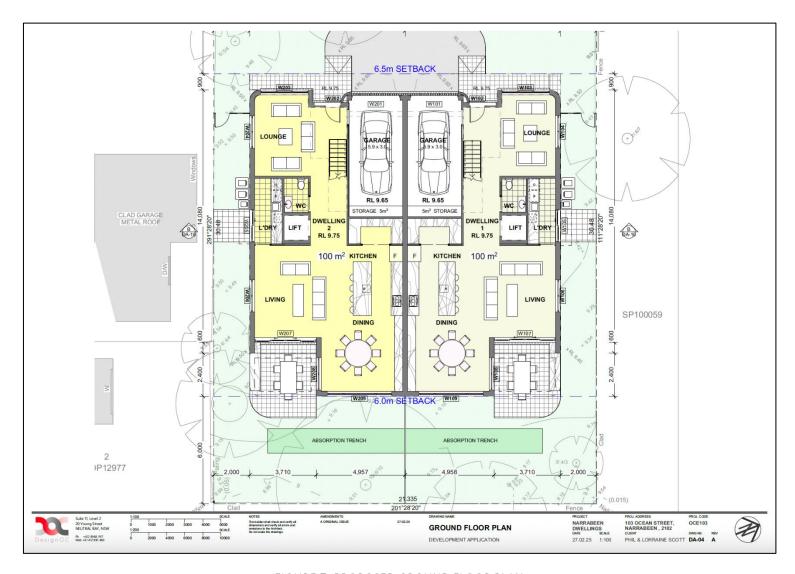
PROPOSED GROUND FLOOR PLAN
